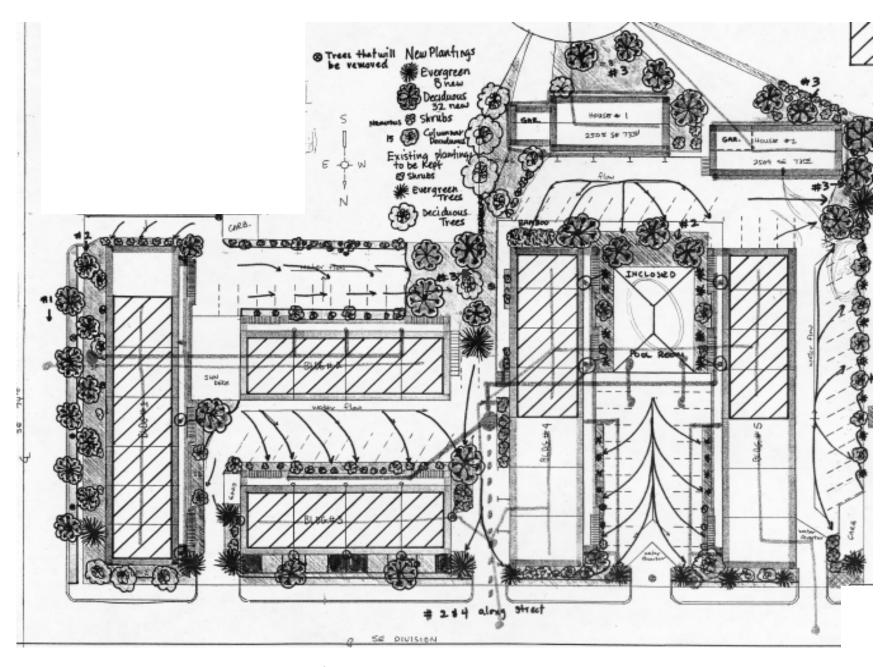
Site Plan of Tabor East Apartment complex indicating flow patterns of parking lots.
